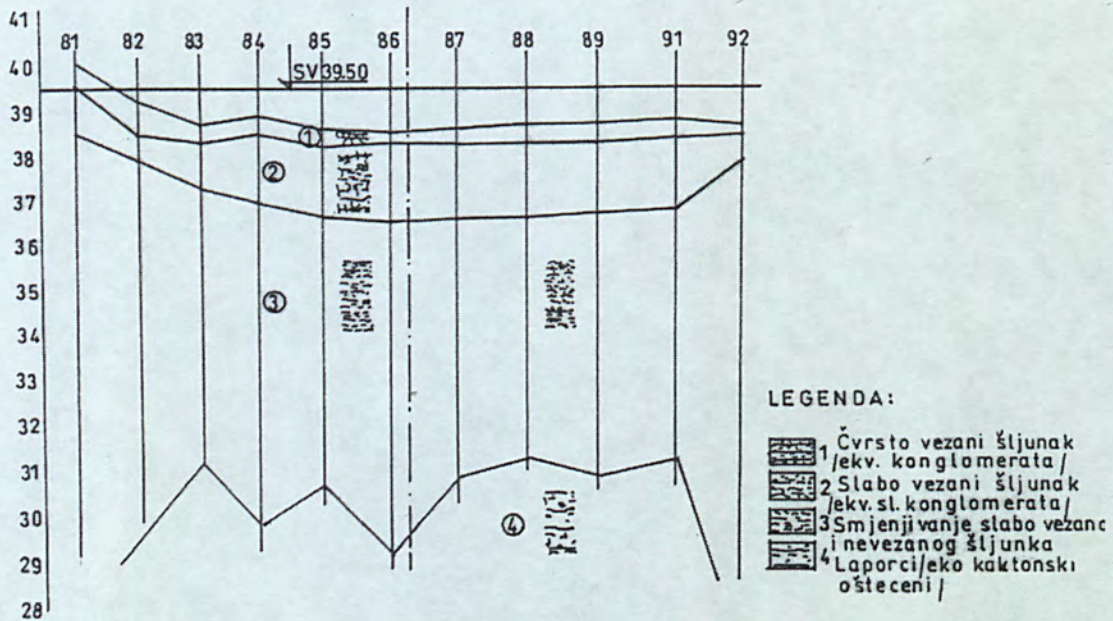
Longitudinal section through spread grouting curtain on the left river-side
